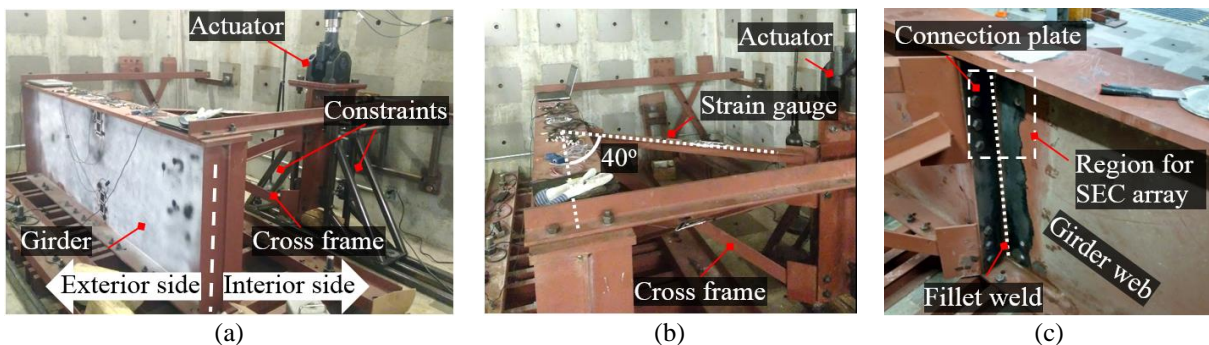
(a) Exterior view of the test model; (b) interior view of the test model; and (c) detailed view of the connection plate. Figure 37(c) shows the specimen prior to installation of the SEC array.
